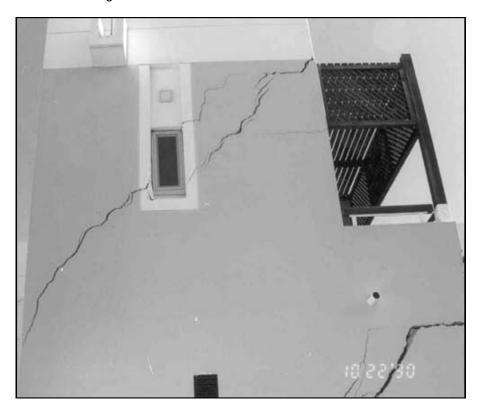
Structural Damage due to Foundation Failure (Al Rawas et al., 2005)
